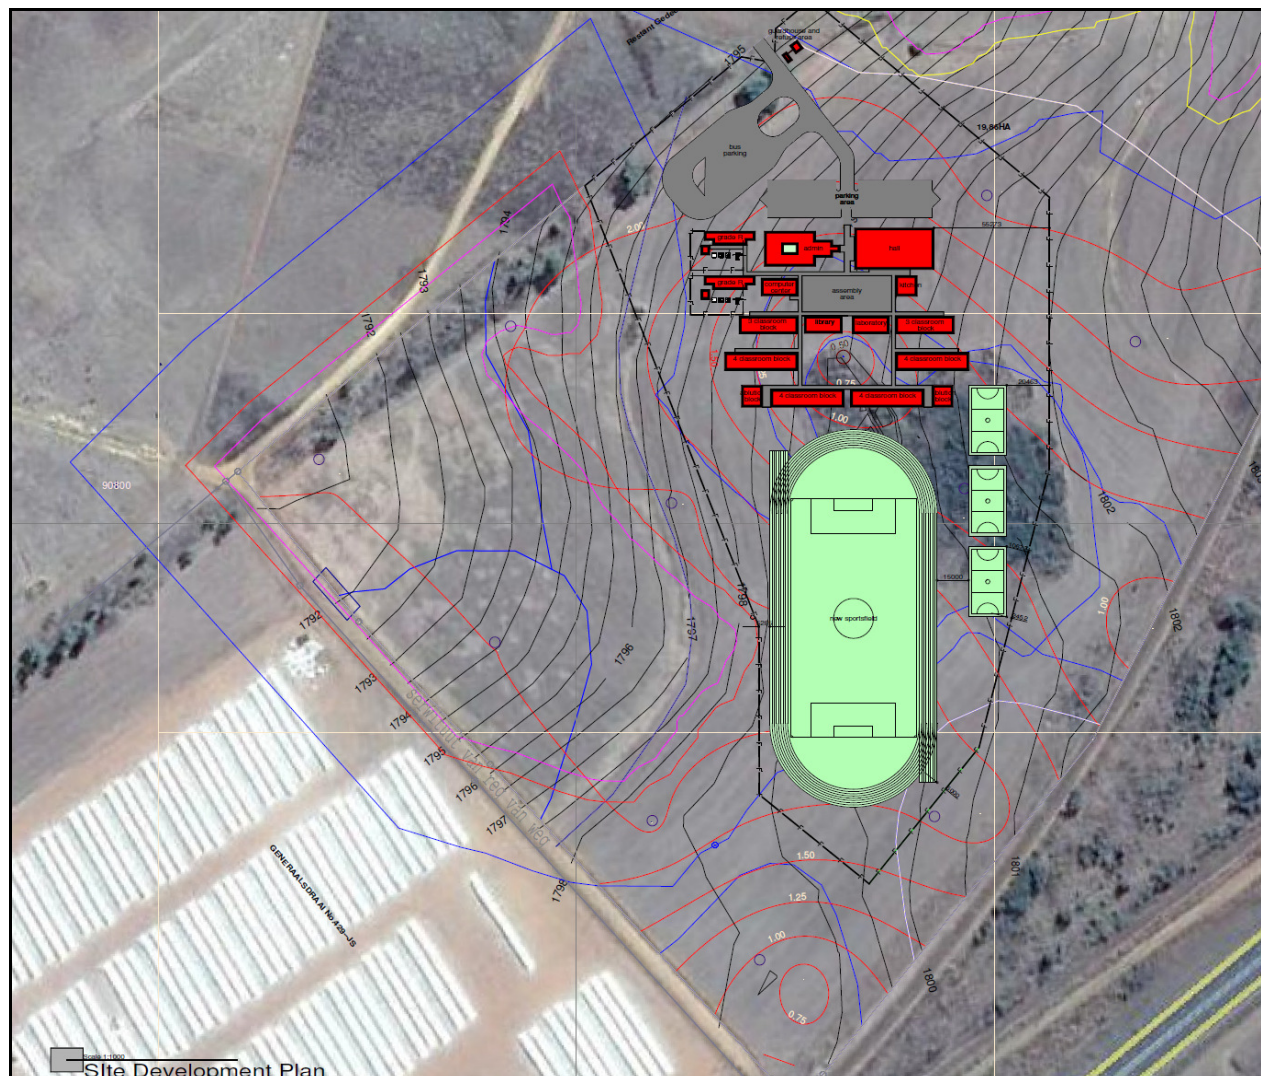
Layout Plan No 1 (original layout plan) (taken from Bakopane Architects, 2016)
